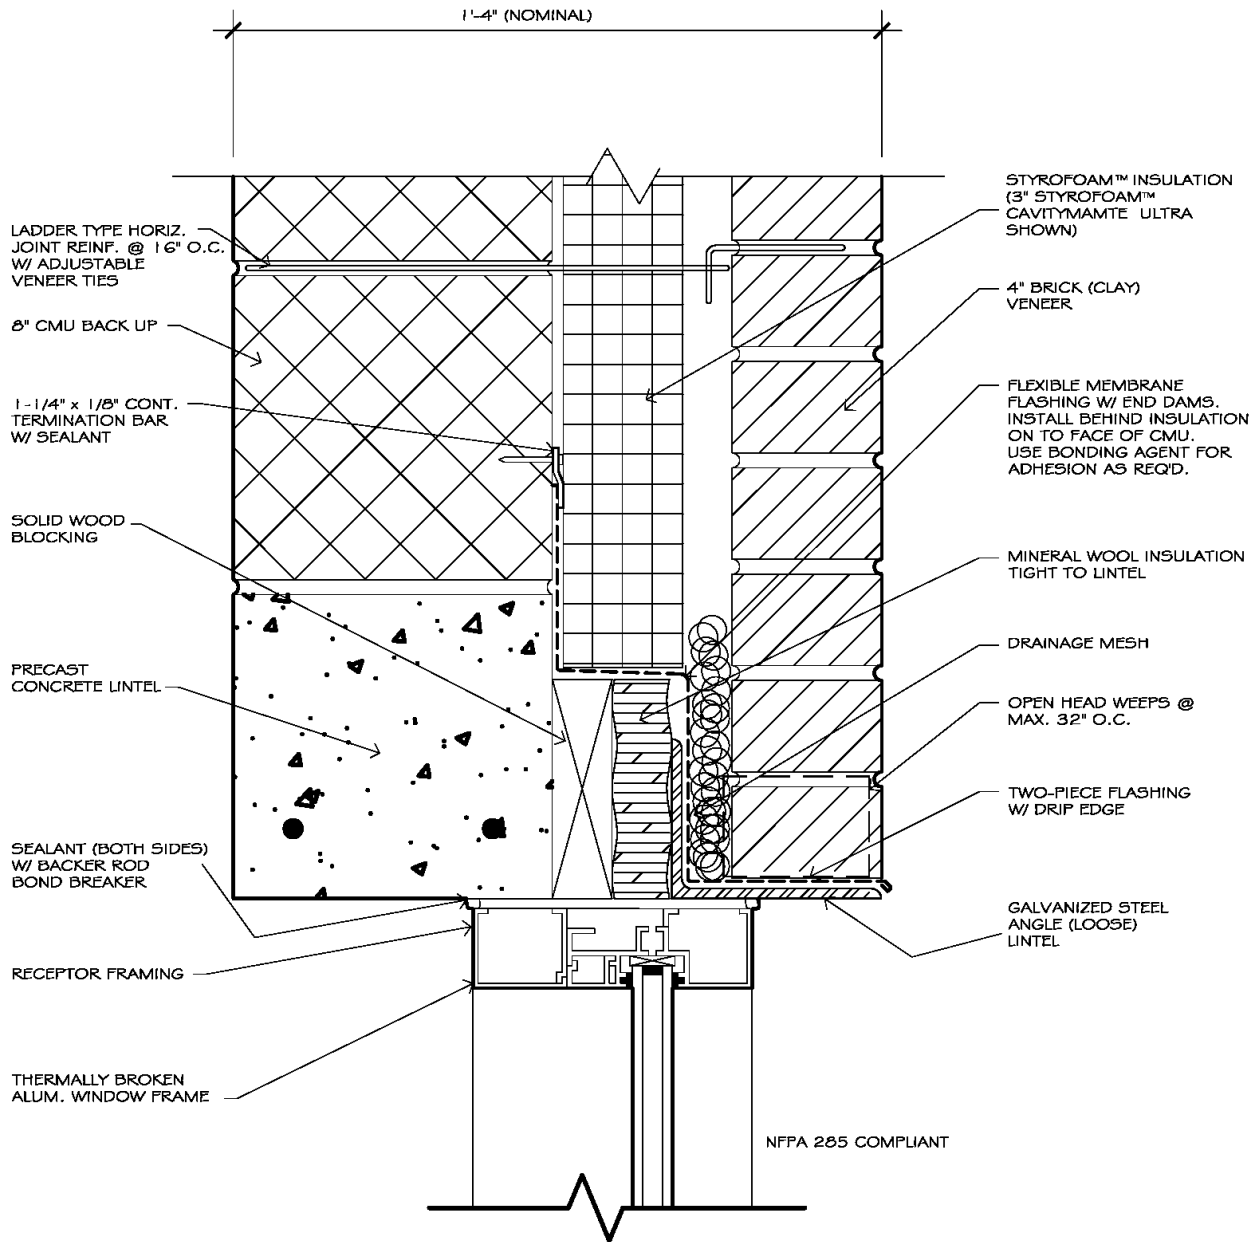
Window / Door Opening Detail w/Mineral Wool & Fire Treated Wood Blocking
